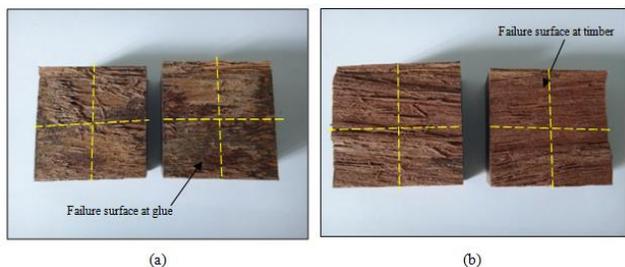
Surface Failures for Kekatong Test Blocks; (a) Adhesive Failure at 50% of Wood Failure; (b) Cohesive Failure at 100% of Wood Failure
